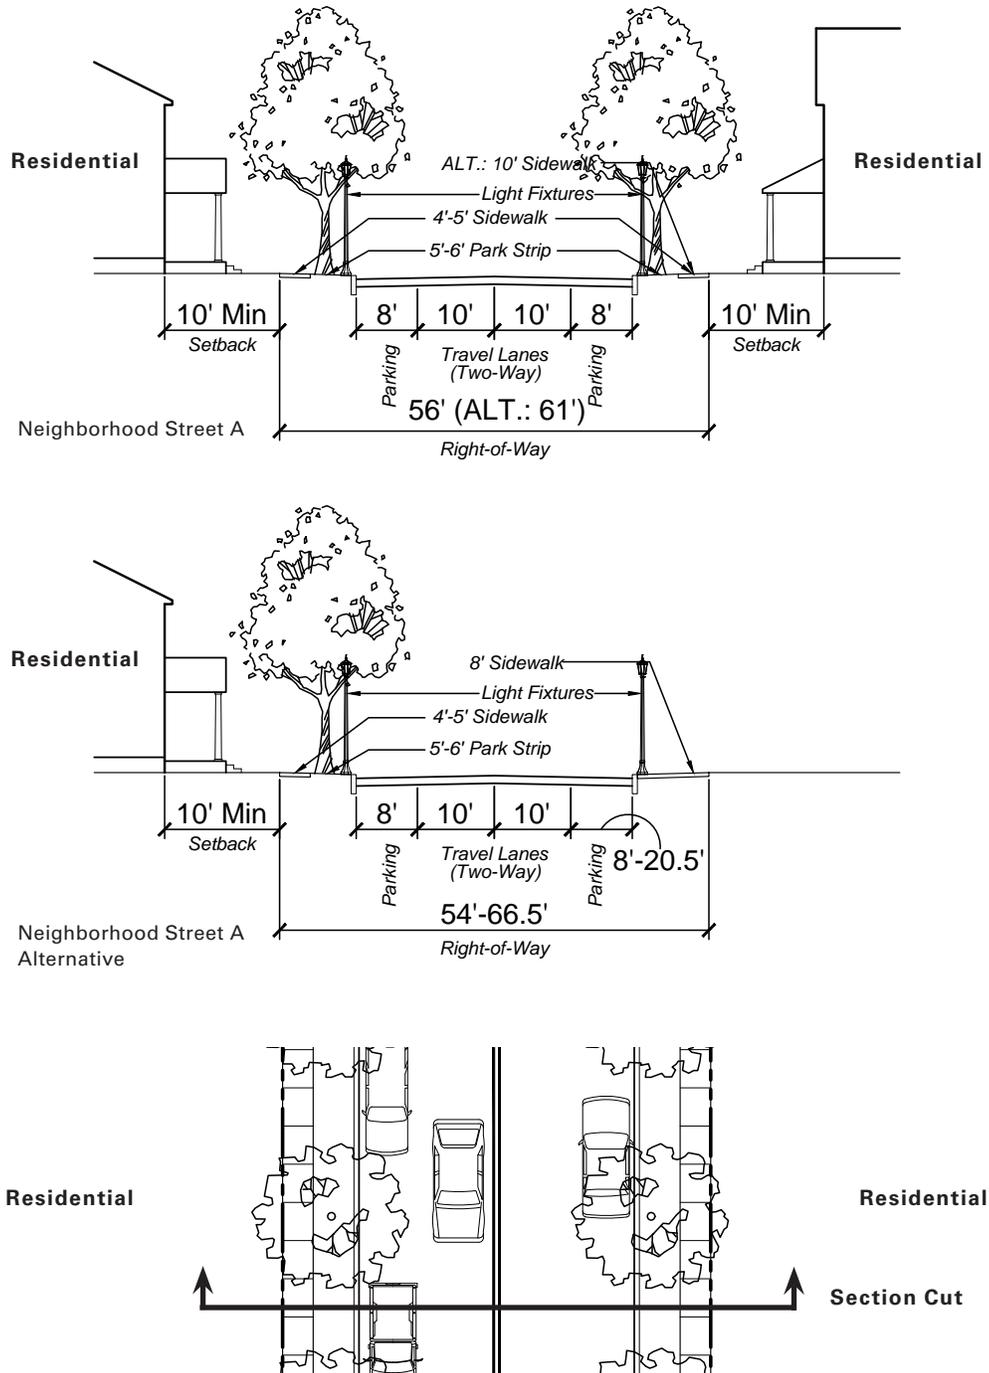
Proposed Section and Plan: Neighborhood Street A
